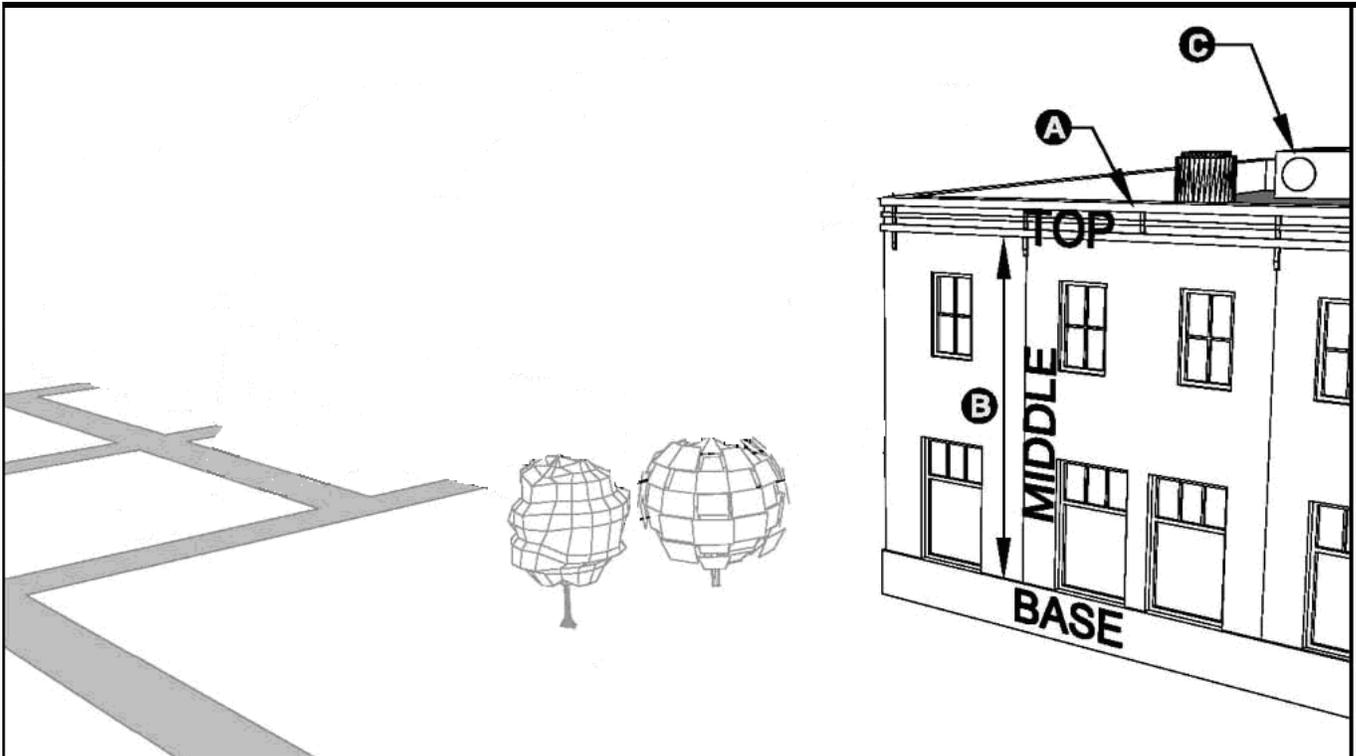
Different Roof Configurations. A well designed building roof provides screening, reduces the building scale, diverts the fall of rainwater, highlights important areas and creates a graceful “cap” to the structure, among other things.
